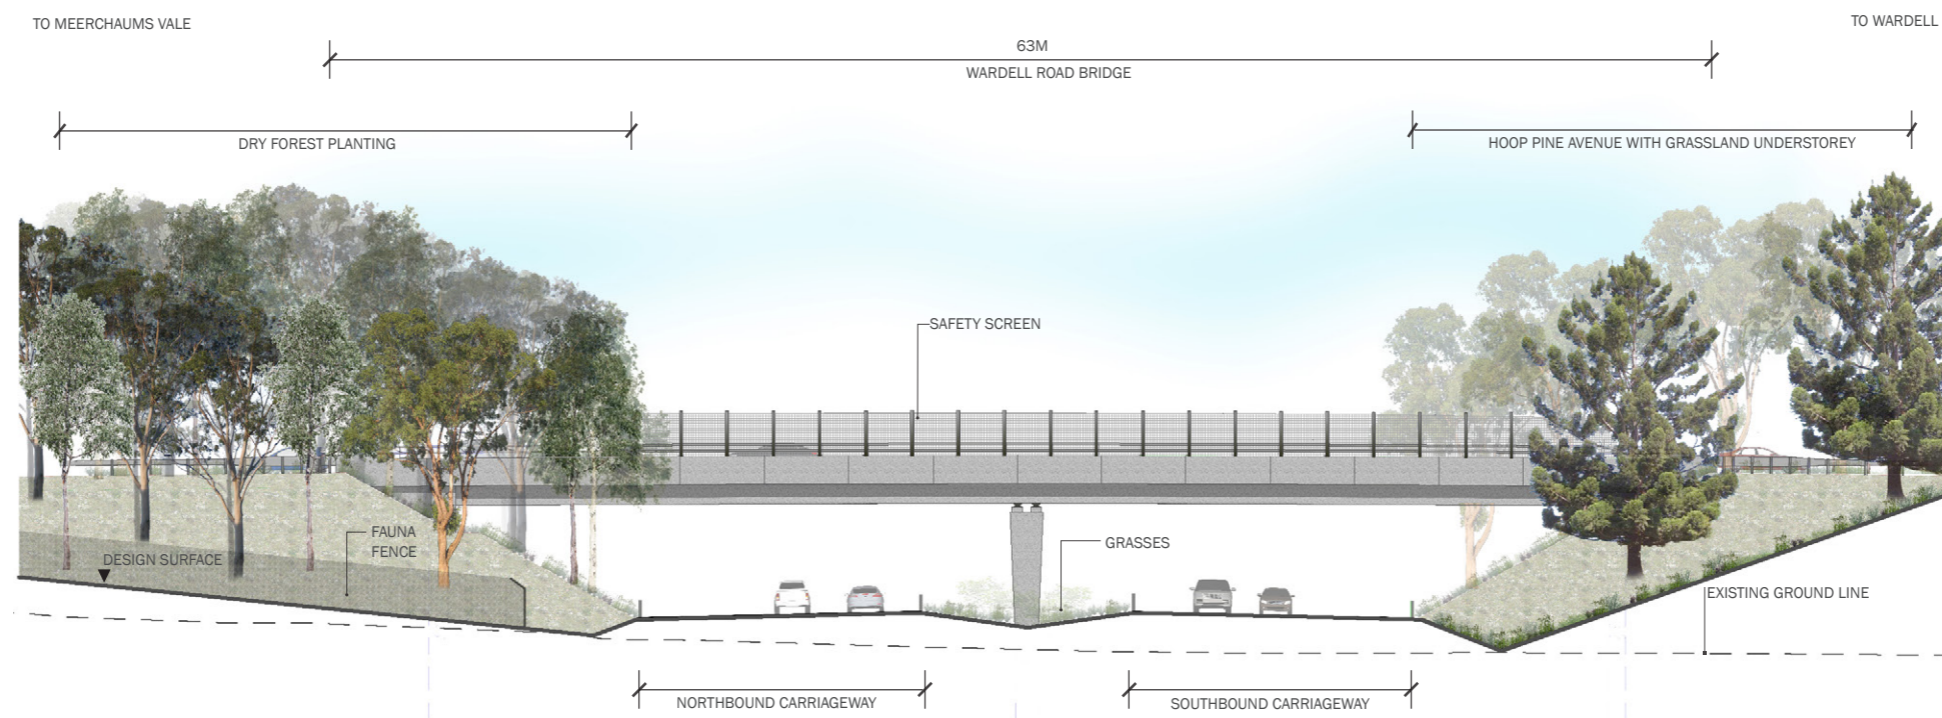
Wardell Road overbridge elevation (Scale 1:400) Note: Fence locations and types are to be confirmed, and subject to further design development
